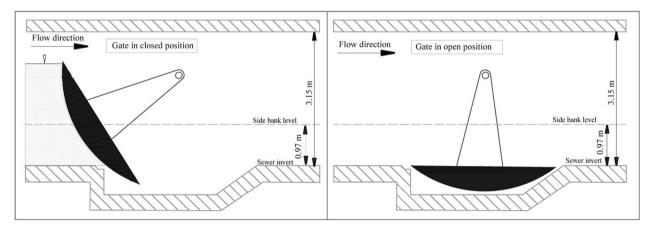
Sketch of the gate installed into Collecteur Des Coteaux and used for the flush experiment.
